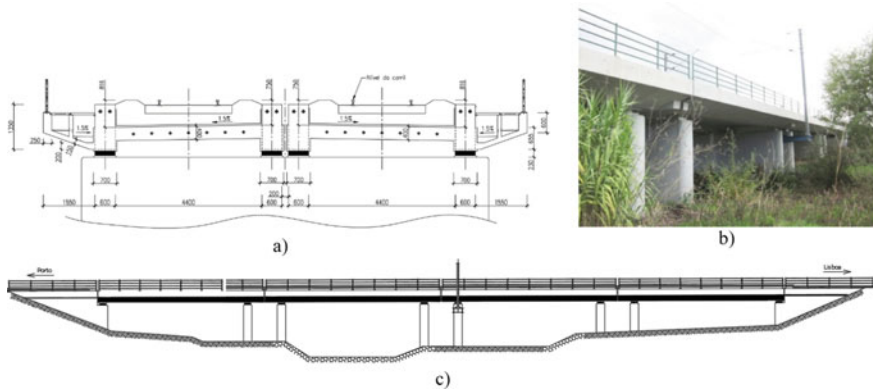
Railway bridge overview a Deck cross section b reinforced concrete piers c longitudinal view. *Source* Infraestruturas de Portugal
